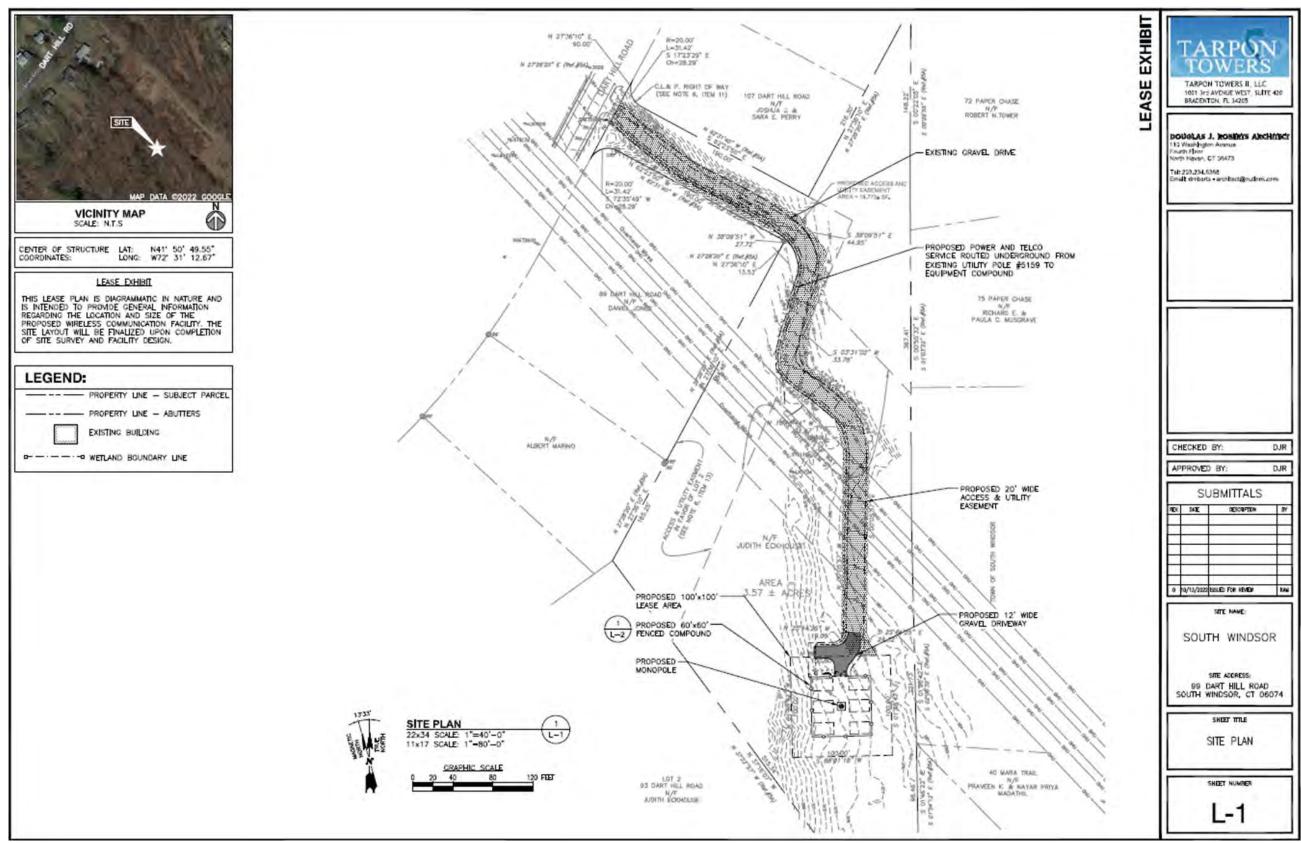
Site plans for the proposed cellular communications facility at 99 Dart Hill Road in South, Connecticut.
